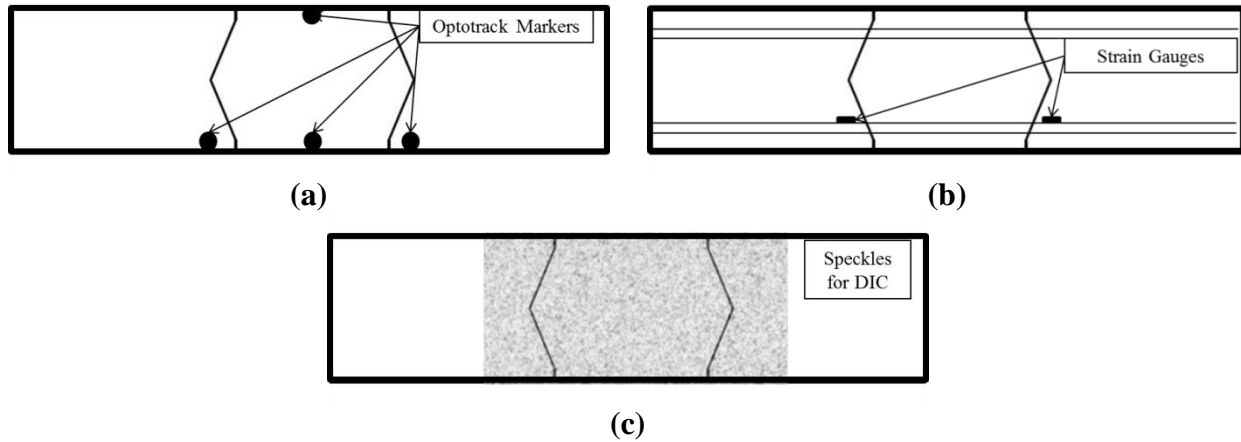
Instrumentation of the Precast Bridge Deck Beams
